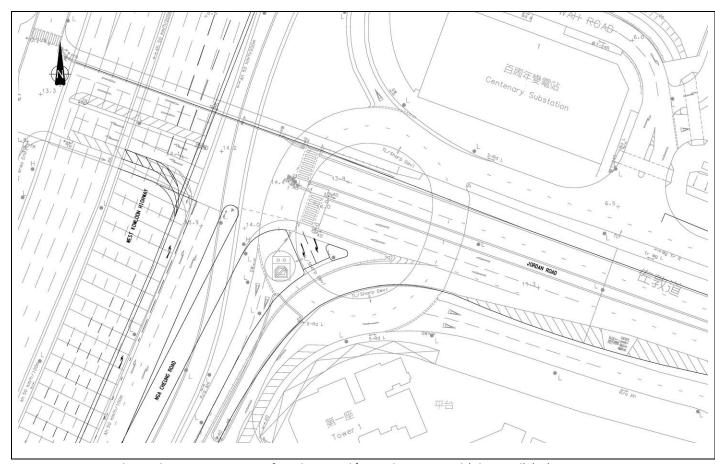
Planned Junction Layout of Jordan Road/Nga Cheung Road (Elevated) (J8)
